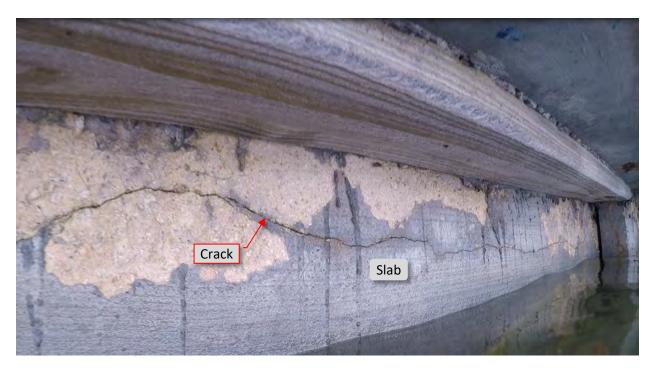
S11. STA 3+49 - 3+55. Crack at top of slab.
